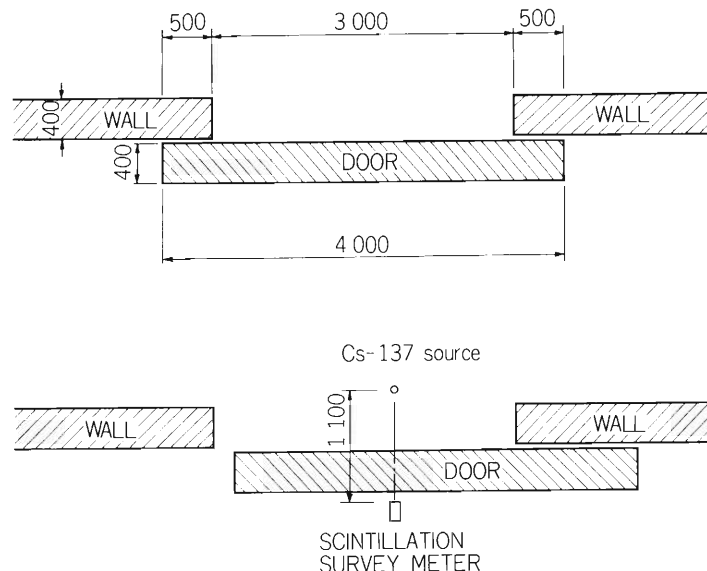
Plan of the shield door (above) and the arrangement for the measurement (below).
